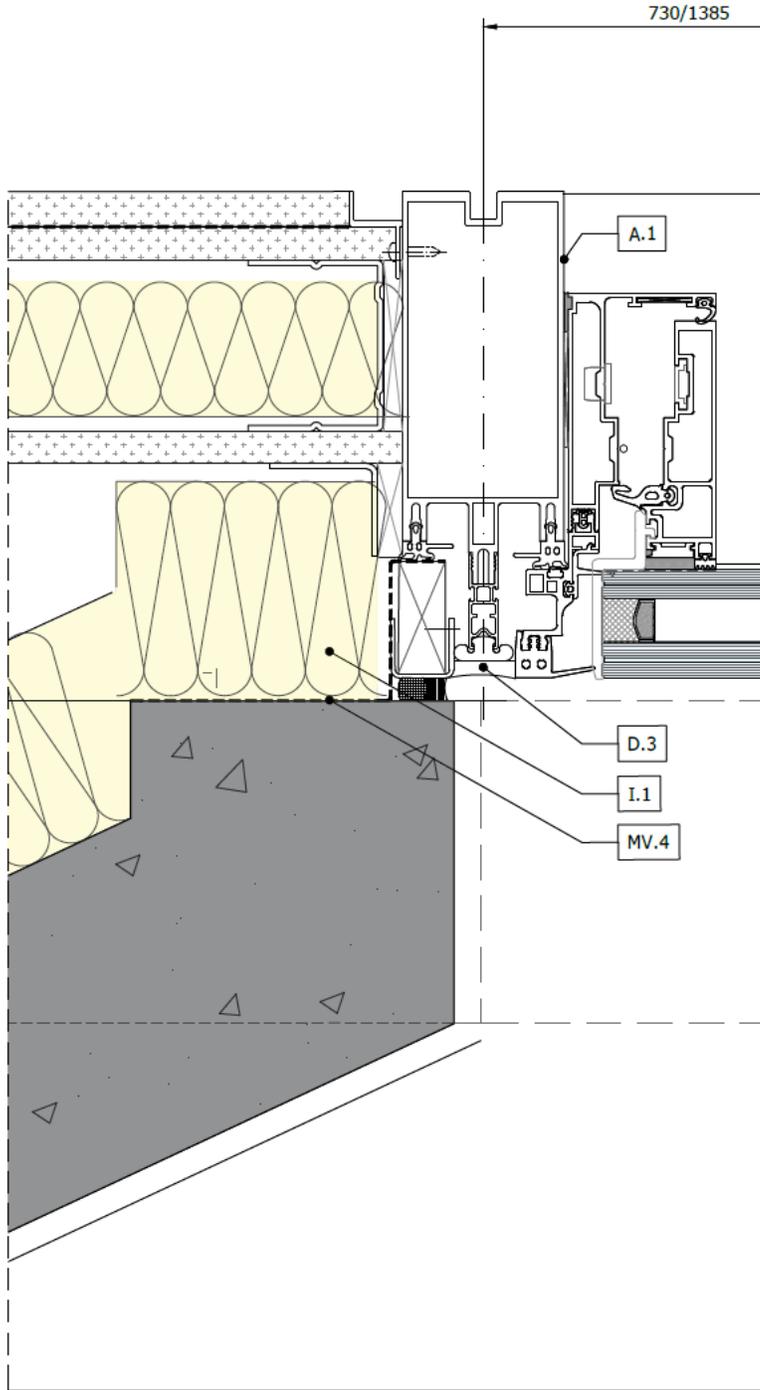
East Elevation WT-1C façade module typical plan Detail 2. Source: Author
